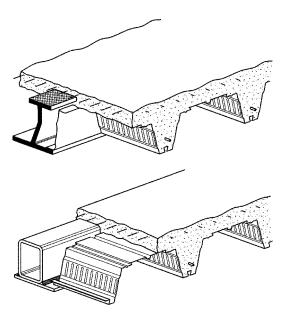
Asymmetrical and rectangular hollow section slim floor beams
